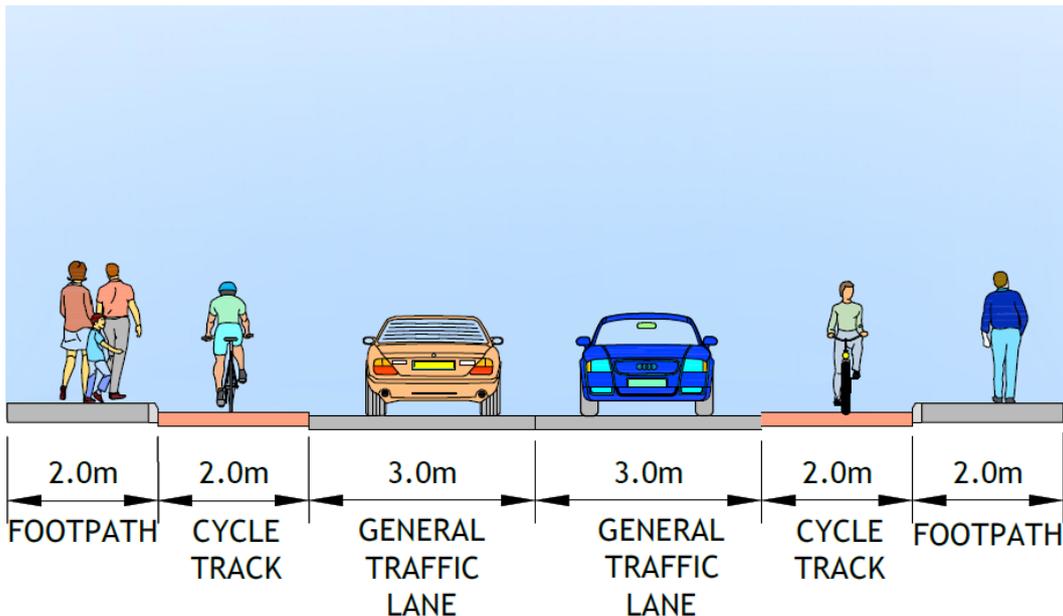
Cross-Section D-D (relevant to RG2 & RG4)
